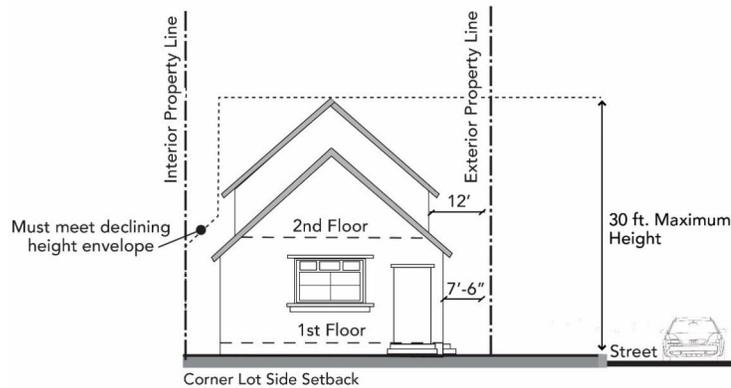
R-1 and R-1 Finish First Floor Exception for Declining Height Envelope
